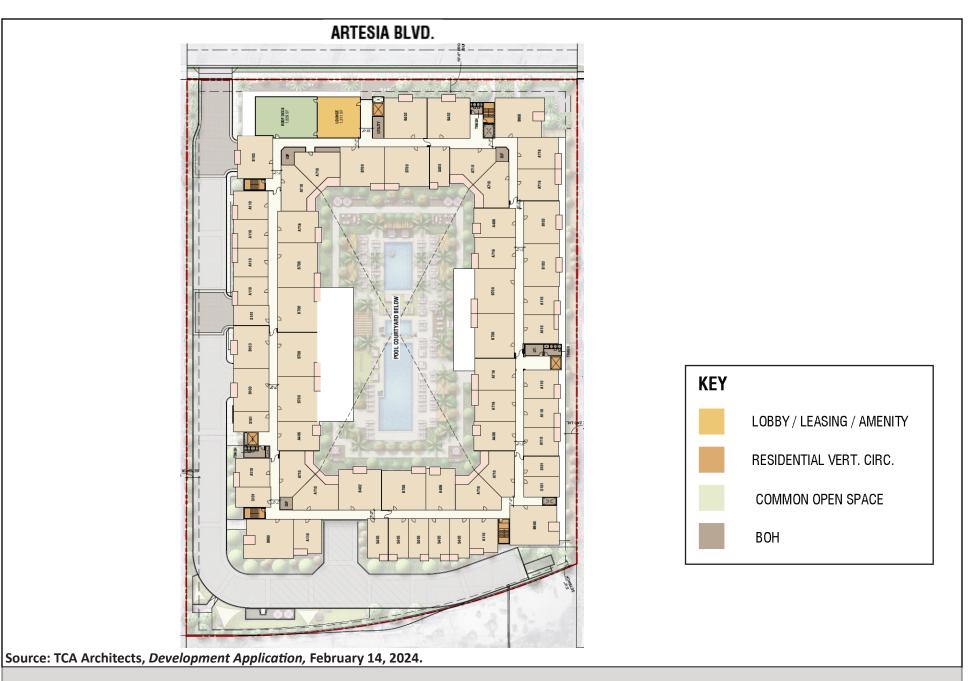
F: CONCEPTUAL SITE PLAN - LEVEL 5
